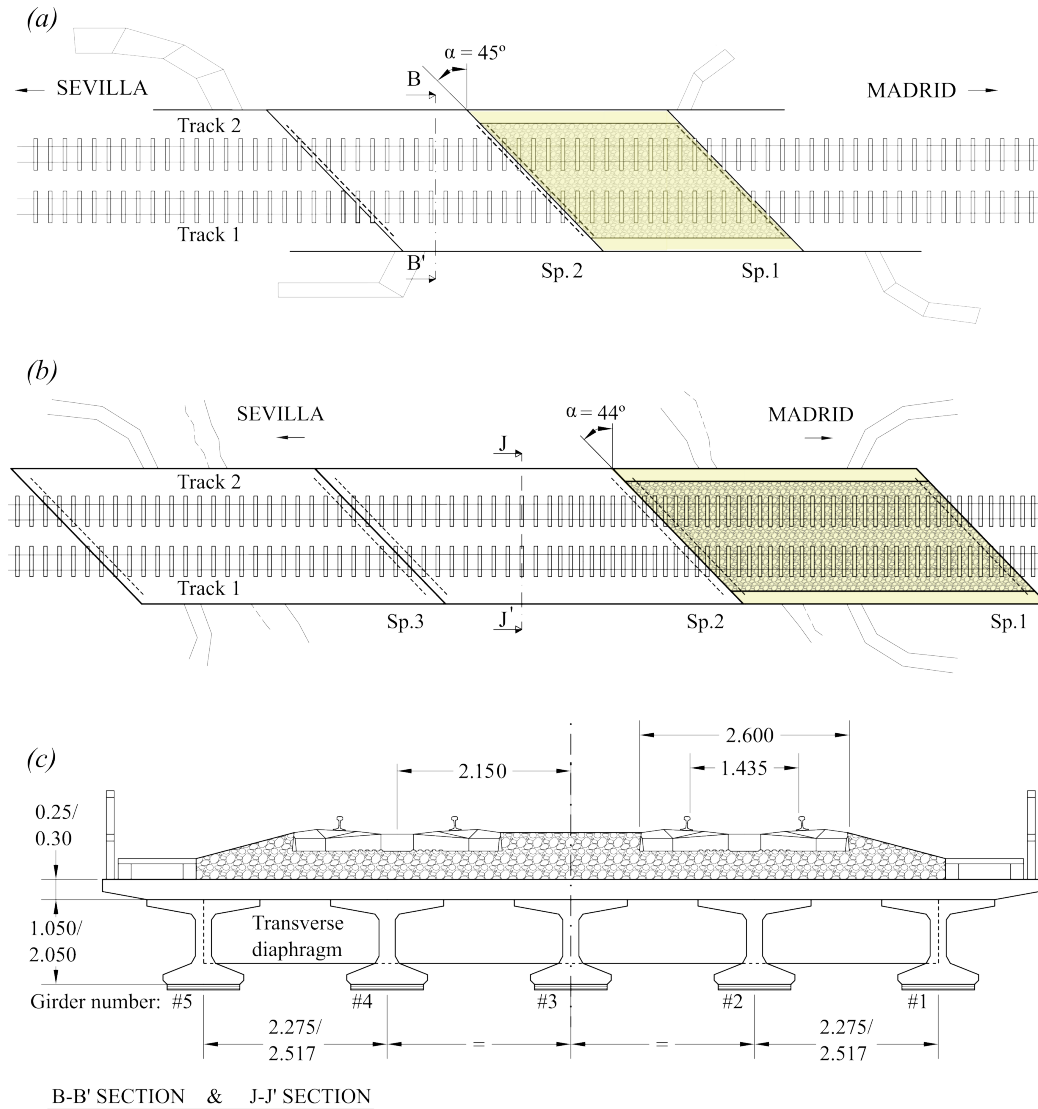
Technical drawings of (a) Bracea bridge top view; (b) Jabalón top view; (c) Bracea and Jabalón bridges cross-section B-B' & J-J'.
